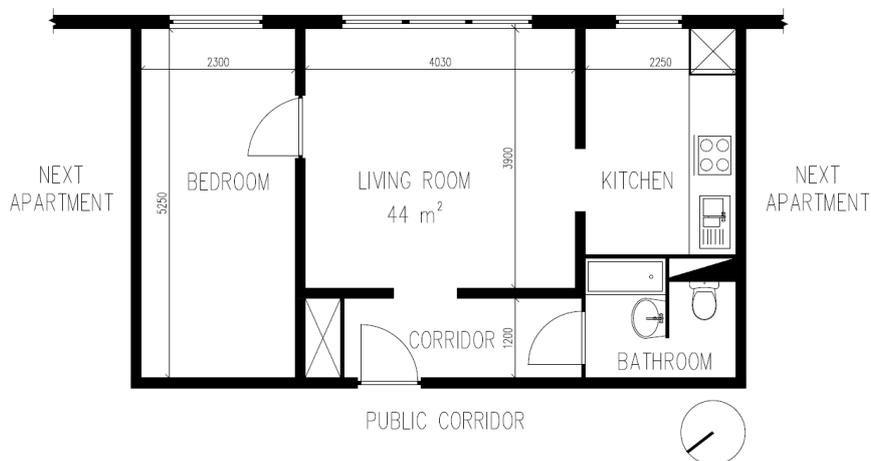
Floor plan of the apartment, Ostrava, Czechia [12]
